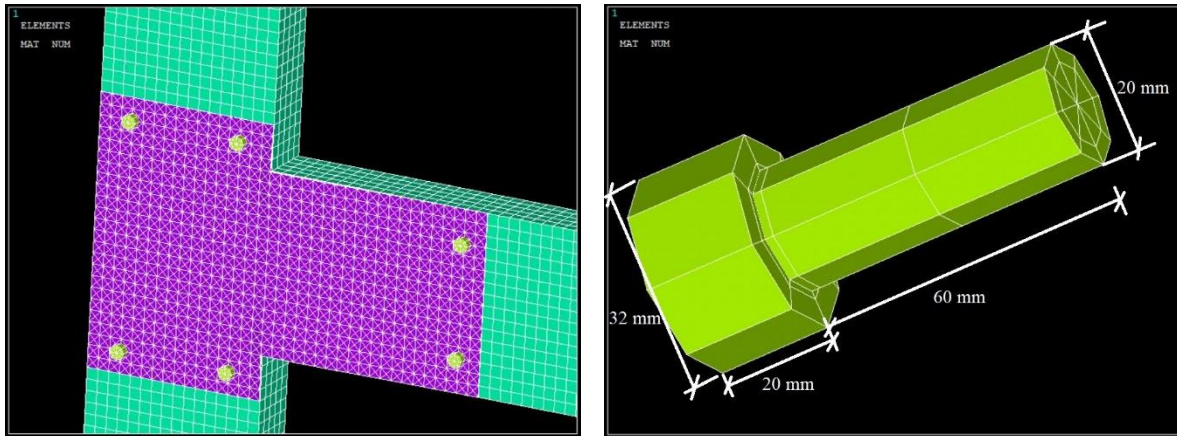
Location and shape of bolts used to connect SMA plate to the concrete joint
